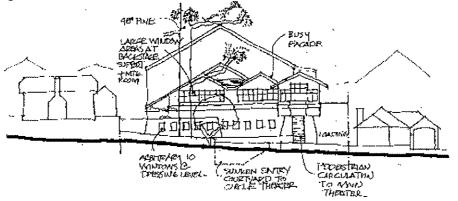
Casanova Street Elevation – design as submitted (Option 'C')
